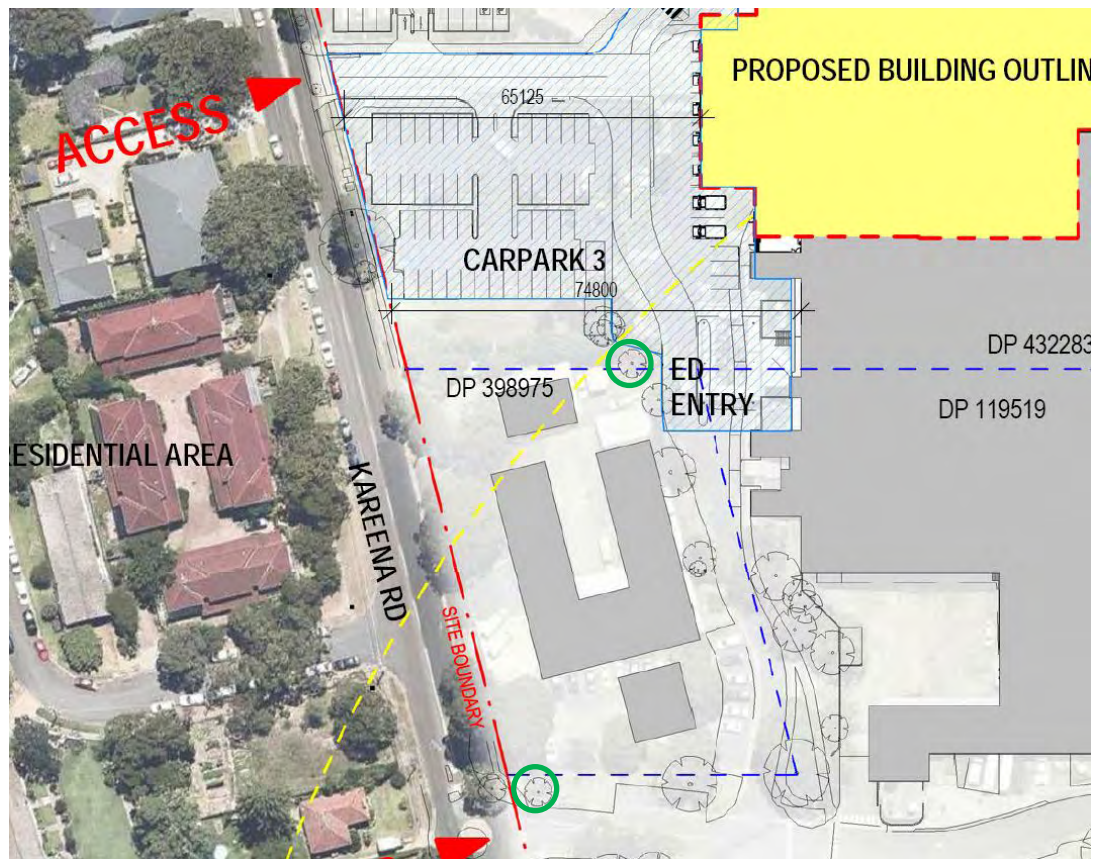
Site Plan - Additional 2 trees to be removed due to poor form (Source: BVN)
